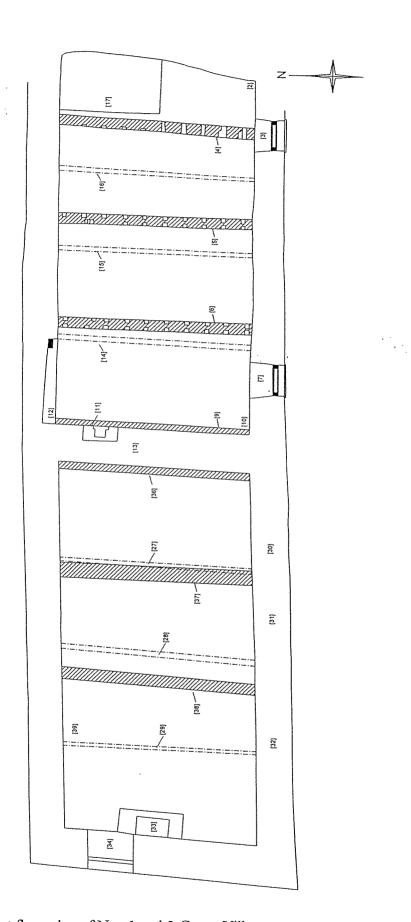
First floor plan of Nos.1 and 2 Green Villas
